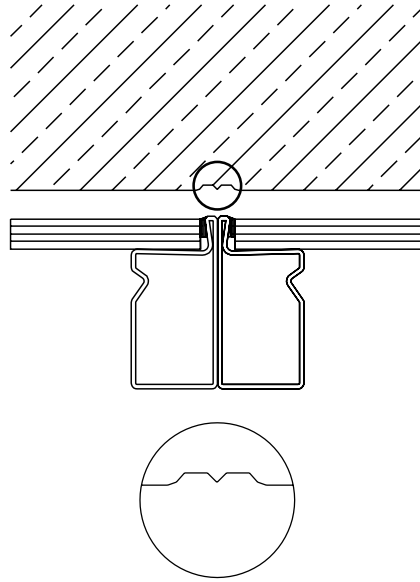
Negative impression in the concrete when using panels with a conventional plywood face
